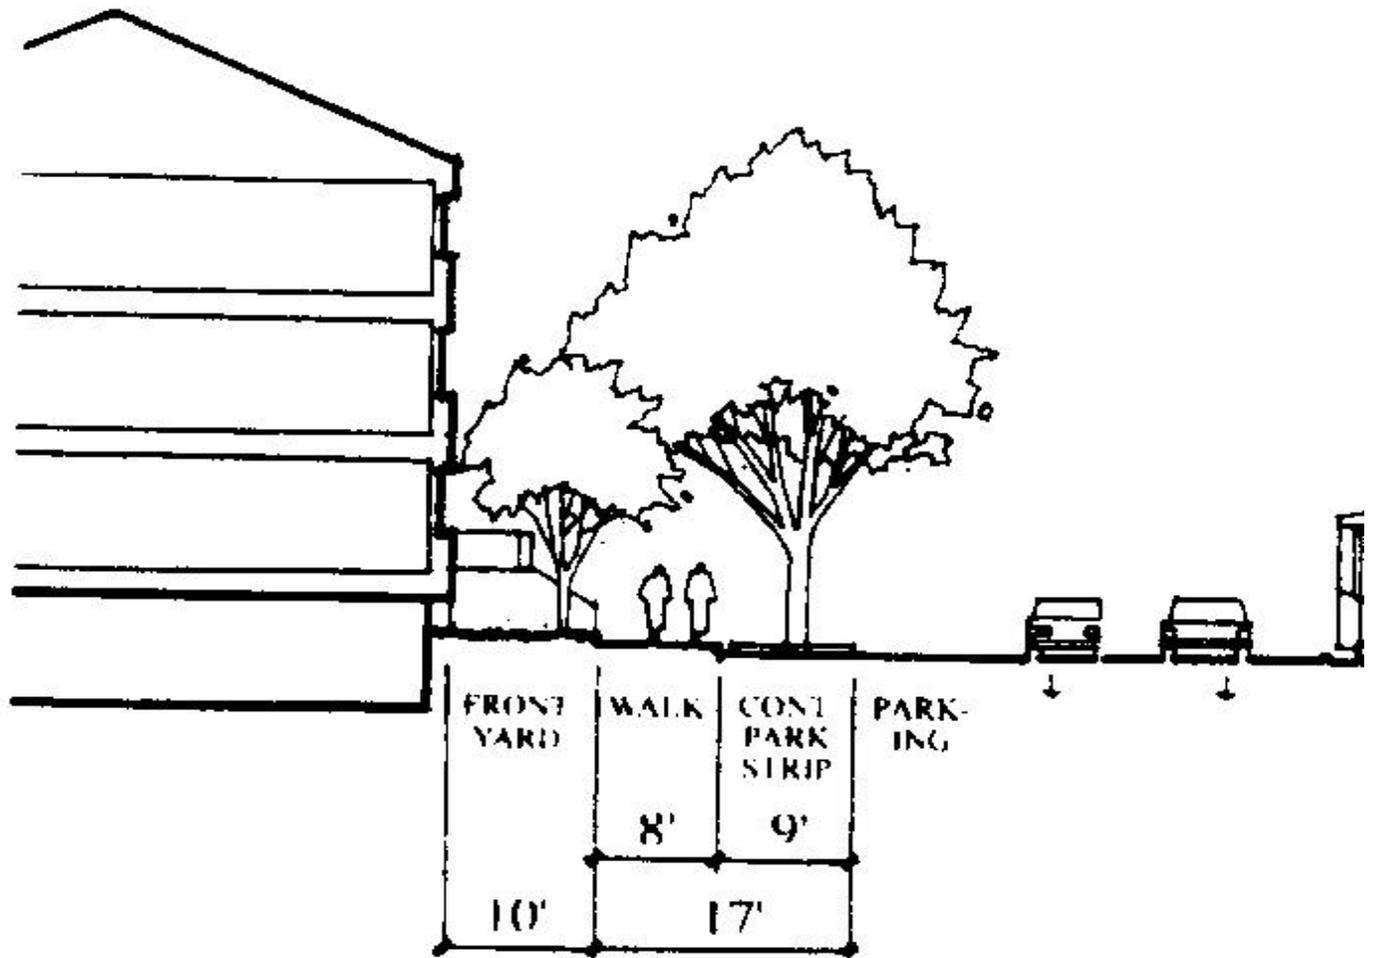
NORTH FIRST STREET/RINCON SOUTH SPECIFIC PLAN
